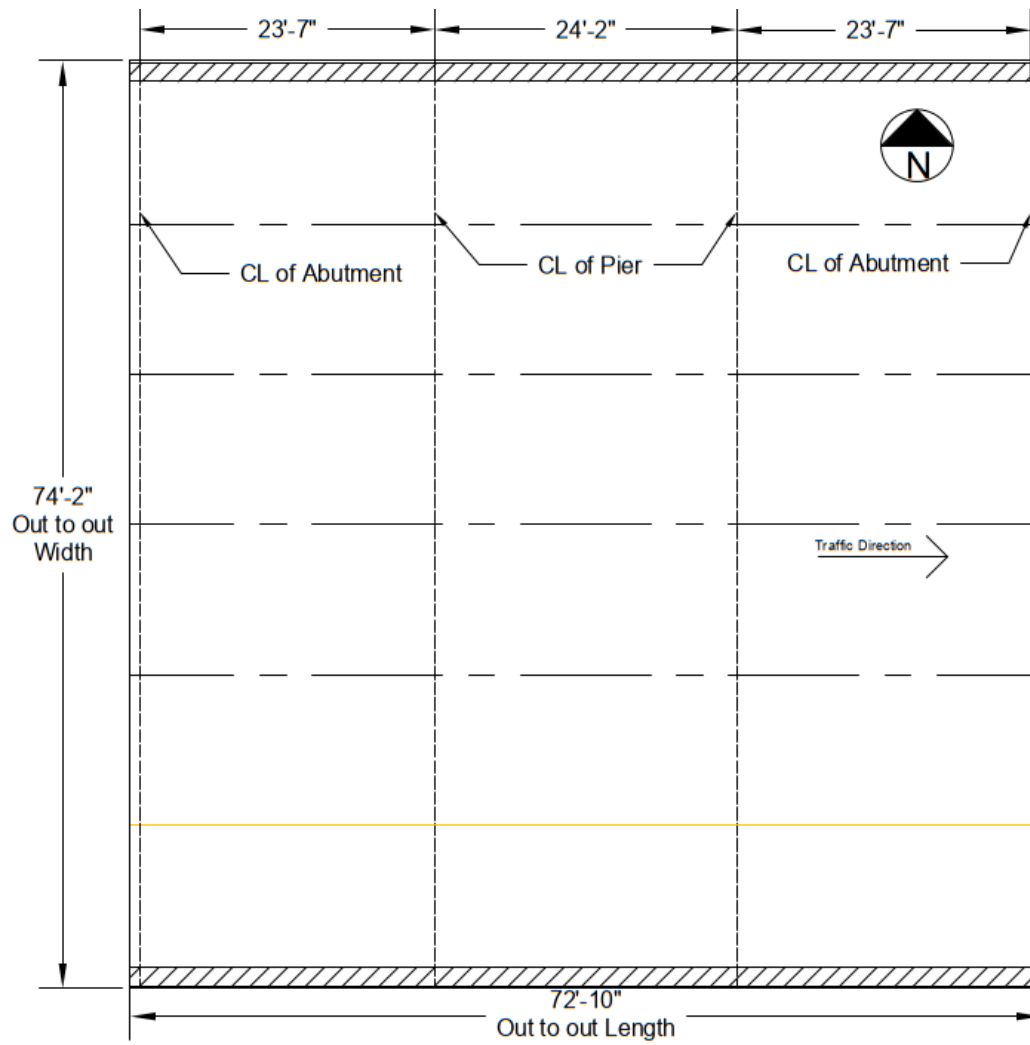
Plan view of the secondary slab-span bridge (Bridge 27925).
